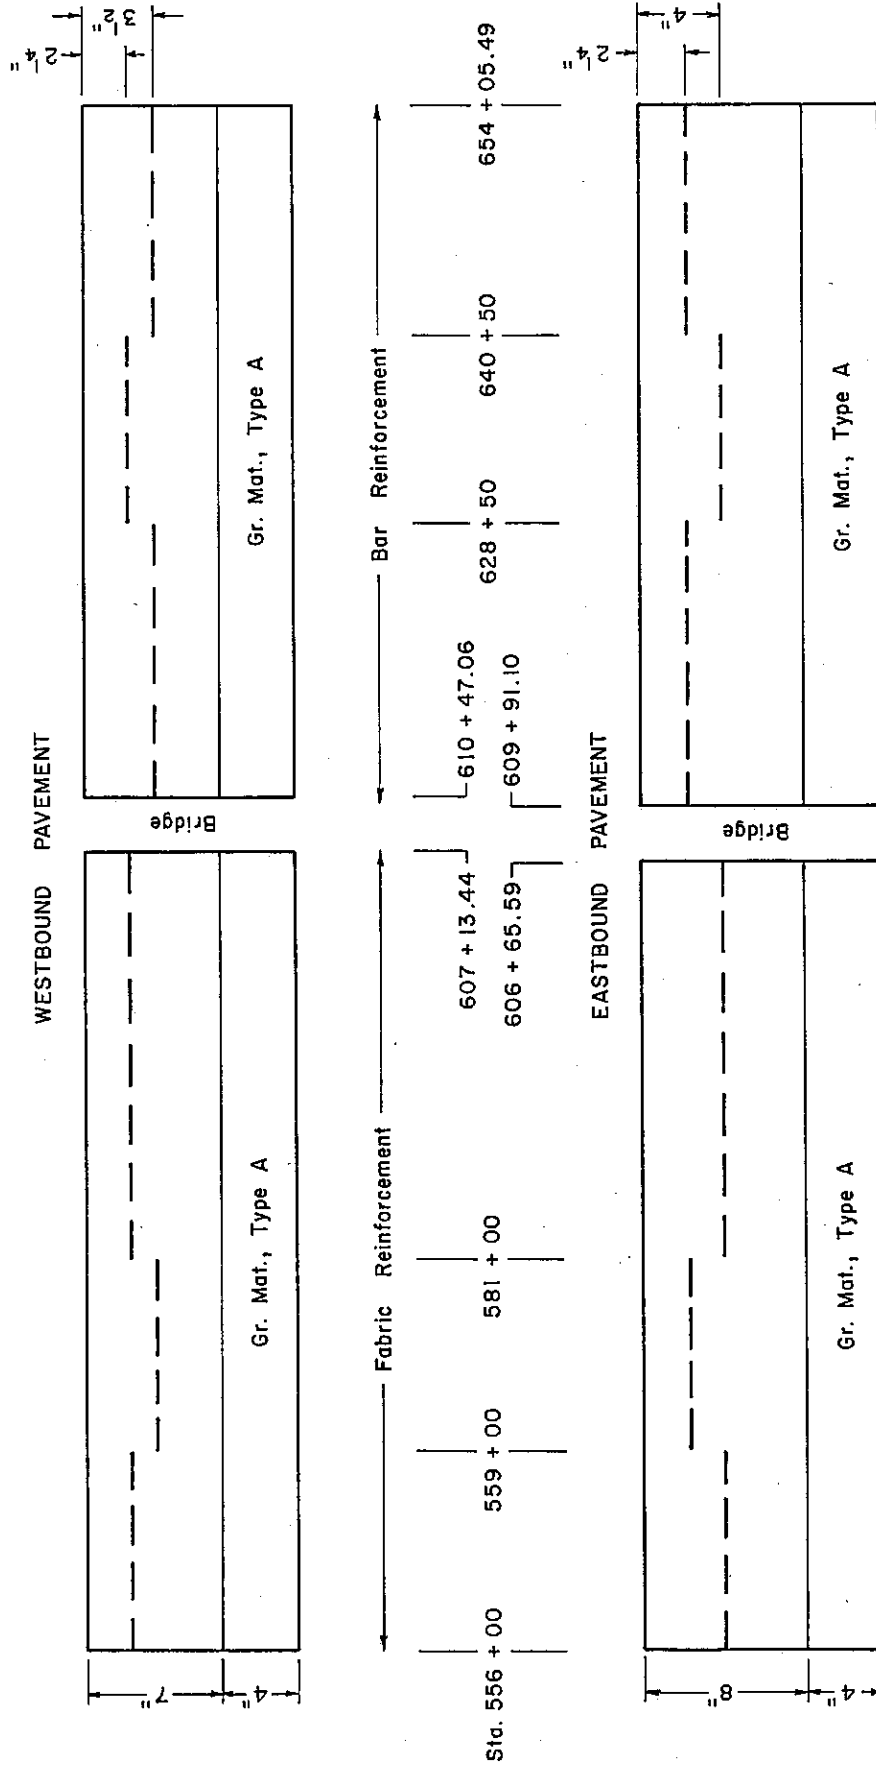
Experimental Sections Of CRC Pavement In District 6.
